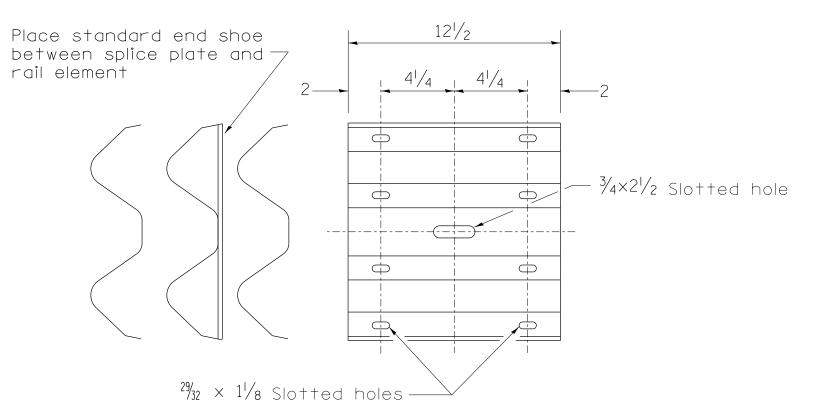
Plate A shall be placed between rail element and block-out at nonsplice mounting points only when steel block-outs are used.
